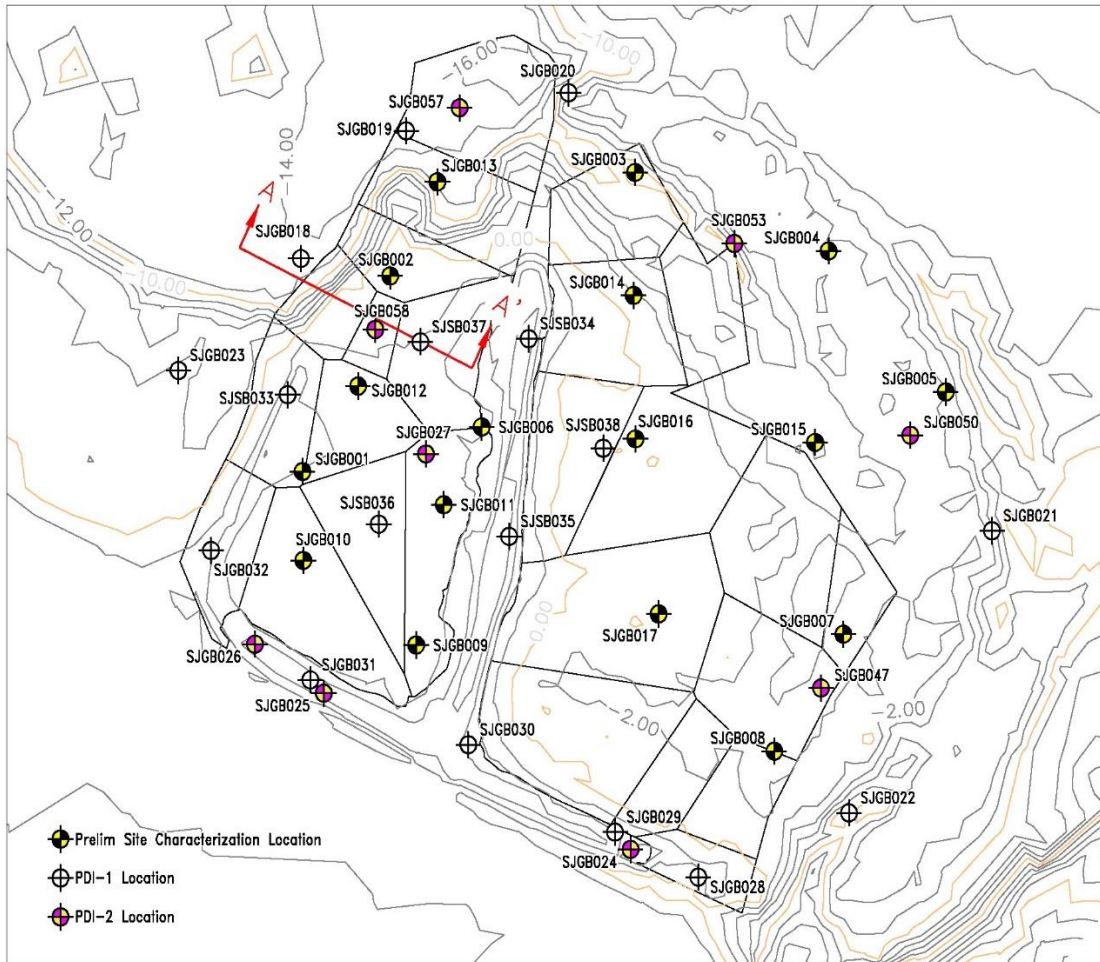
Northern Impoundment Boring Locations, Topography, and Cross Section A-A' Location
